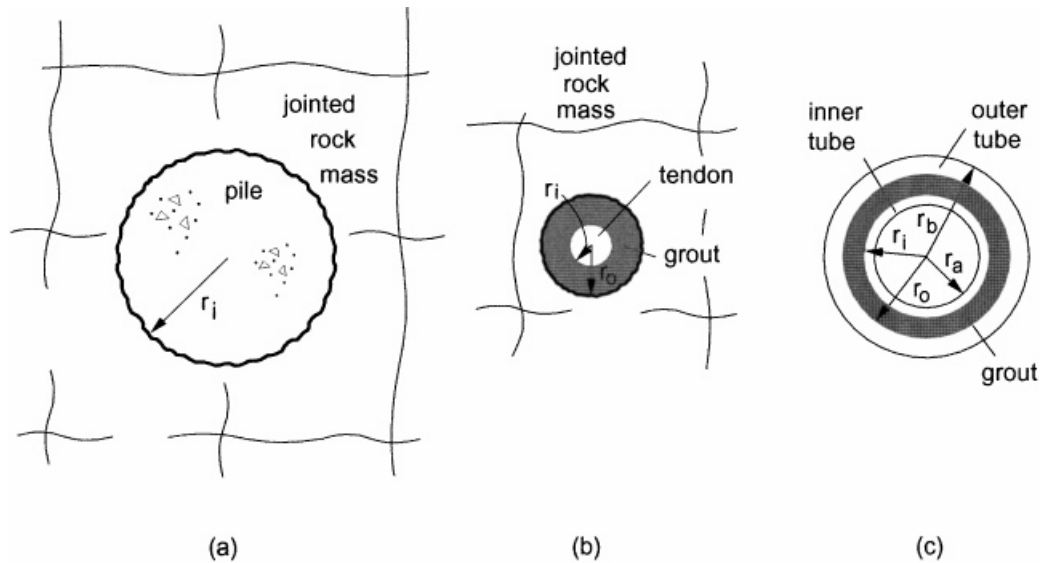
Cross-sections of (a) pile, (b) rock anchor and (c) tubular joint
